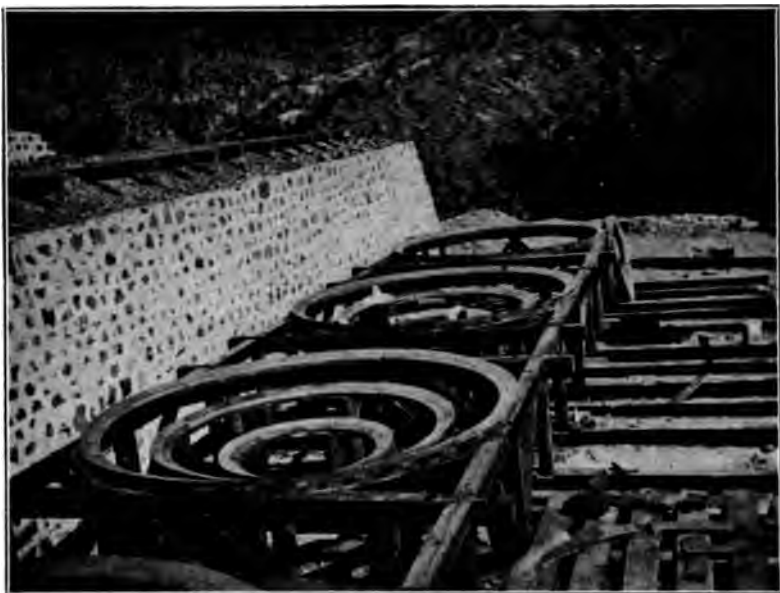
Timber Foundations supporting Decantation Vats of Slime Plant.
